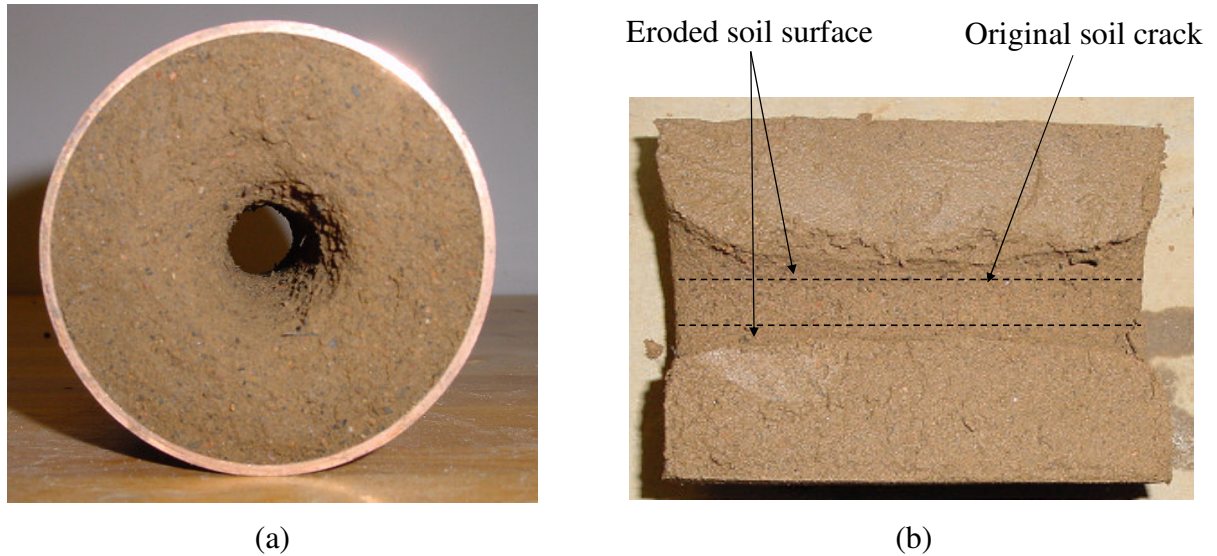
Eroded soil crack after a test on 0.2% lignosulfonate treated silty sand compacted at 95% maximum dry density (a) Cross section (b) Longitudinal section
